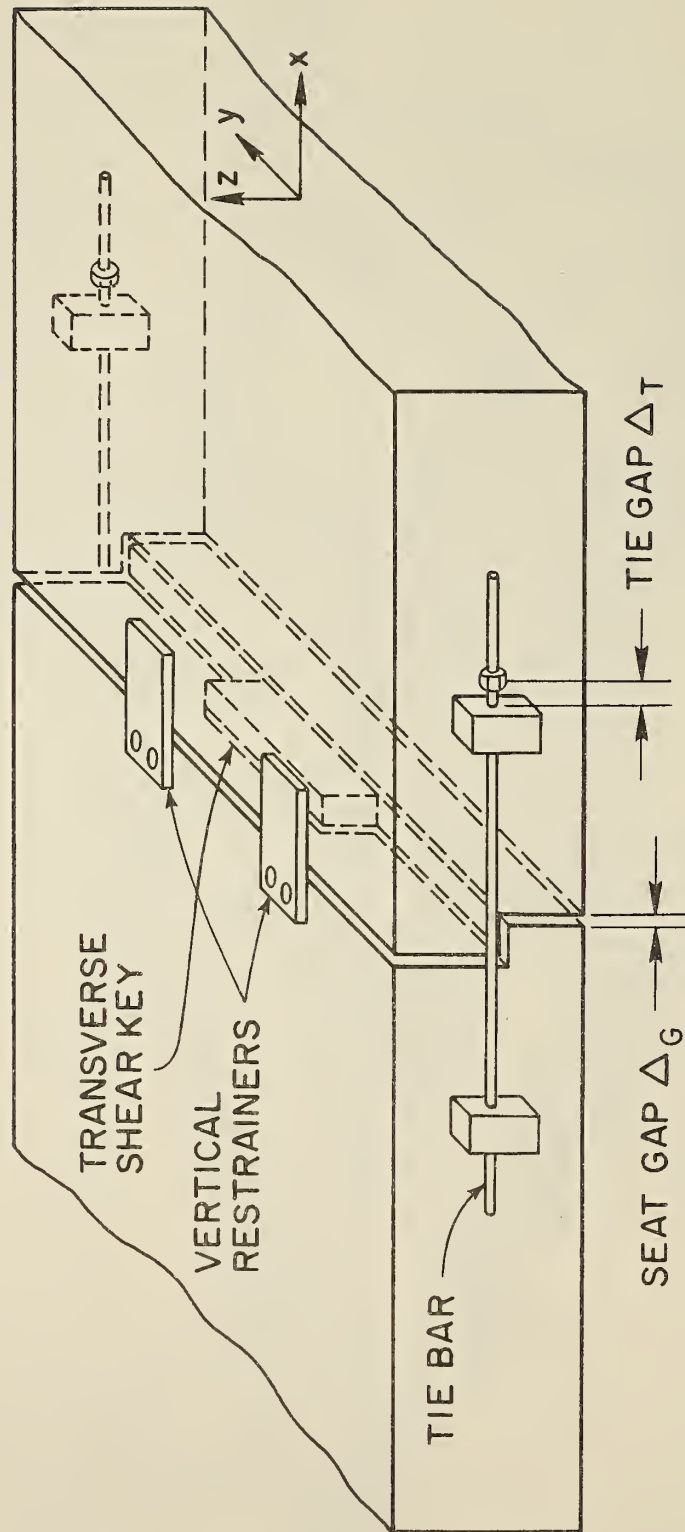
EXPANSION JOINT OF BRIDGE MODEL
